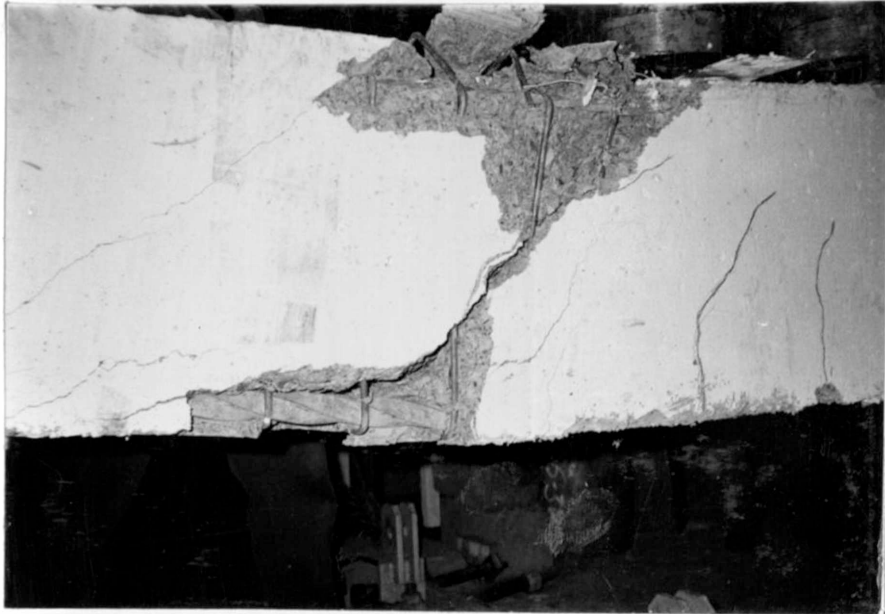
Beam CFT-TB1 at Failure (rear side)
